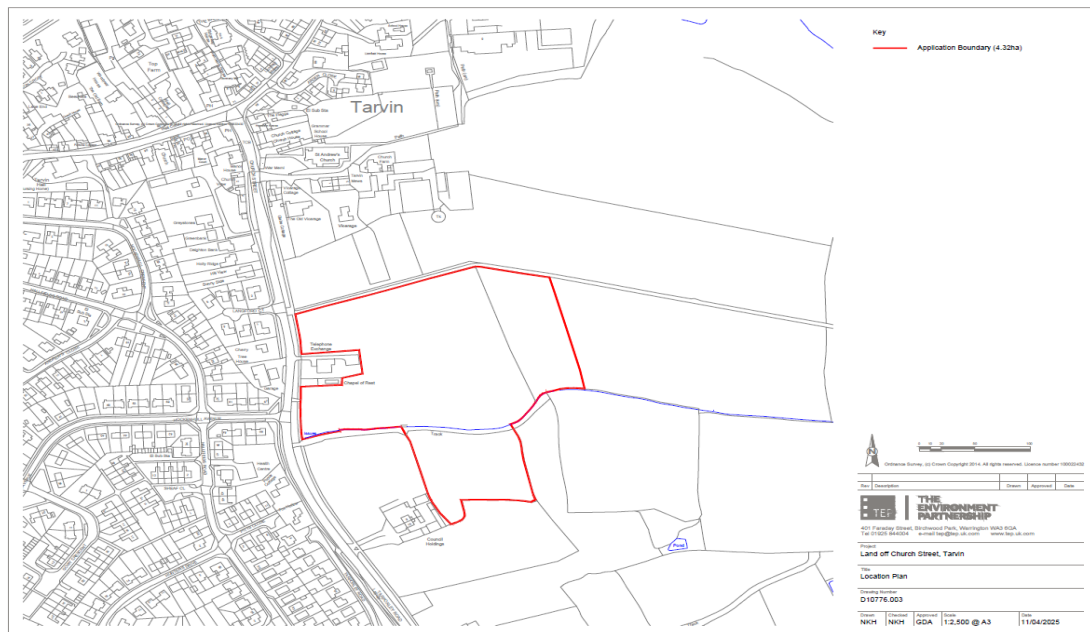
Site Location Plan – Land off Church Street, Tarvin
